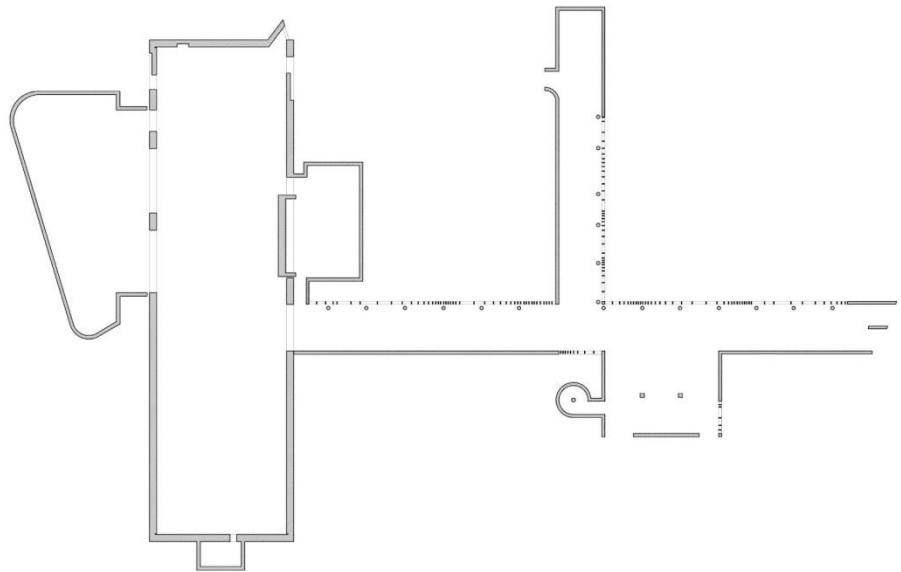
plan of the "conduits" of the Couvent de la Tourette
